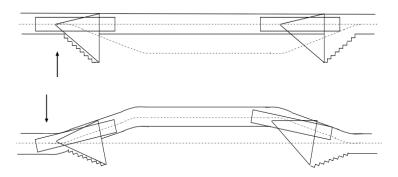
Movement of Machine during Deep Screening of Points and Crossing.
